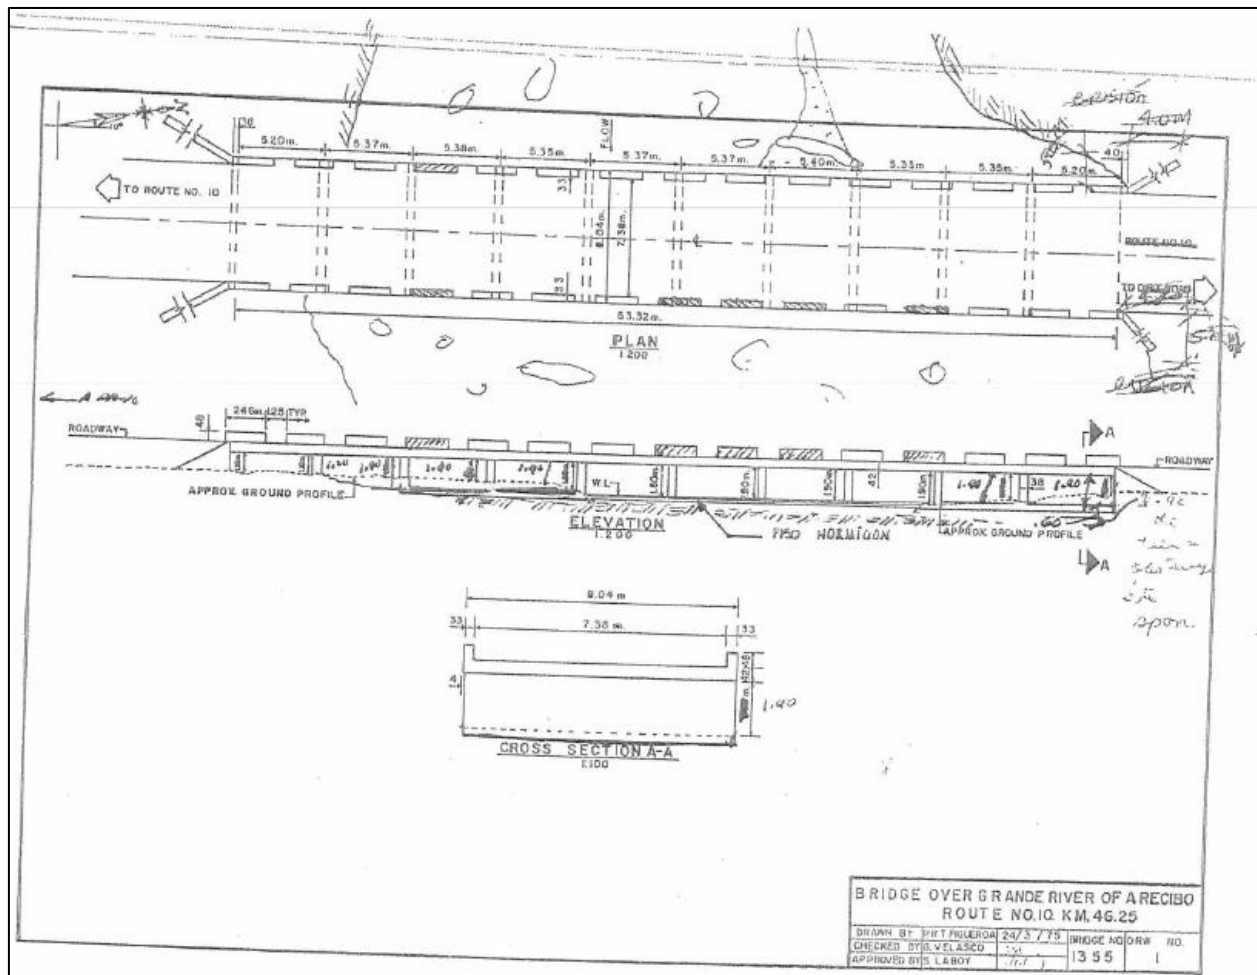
Bridge 1355 drawings (source: PRHTA)
